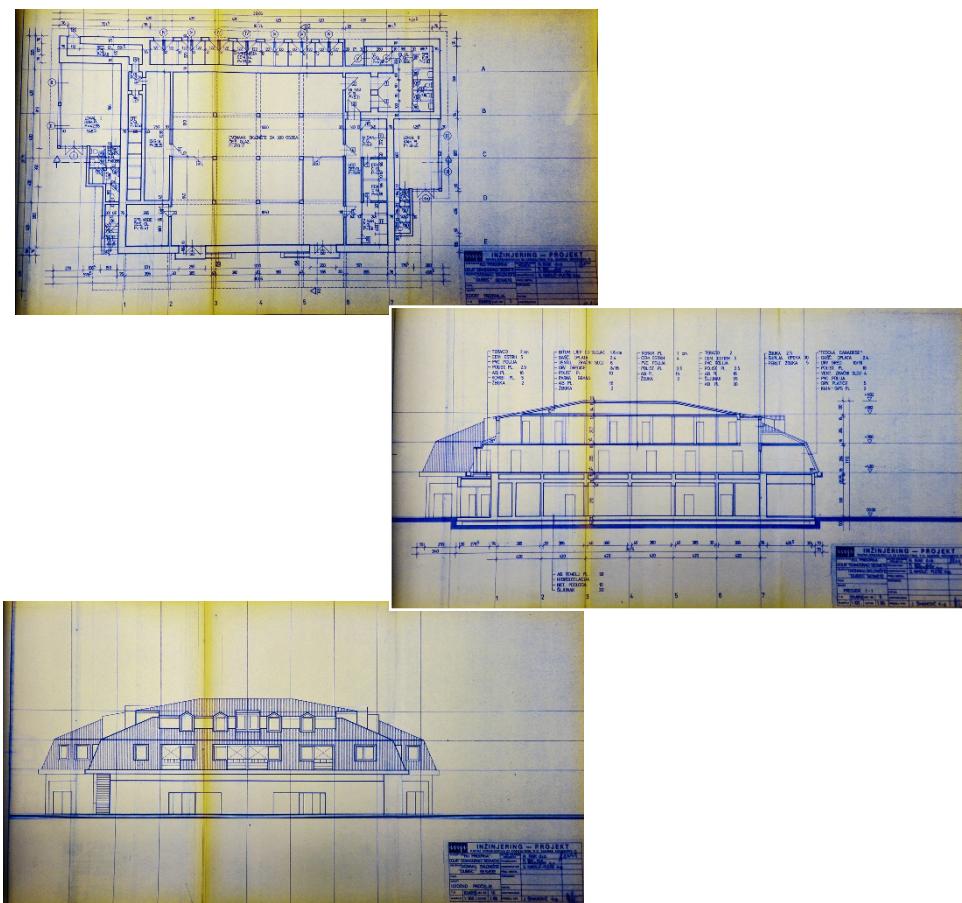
The Revised Detailed Urban Plan for Volovčica, [fallout] shelters (SKLONIŠTA), layout, 1972 / Slika 4. Detaljni urbanistički plan Volovčica, revizija, [atomska] skloništa, plan rasporeda, 1972.
